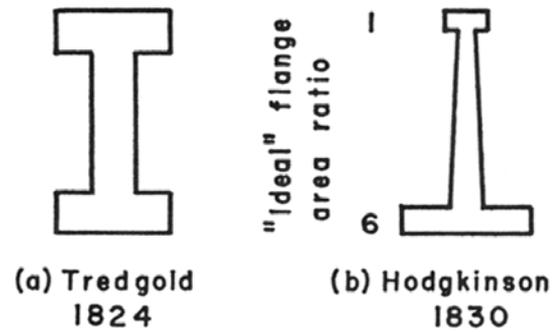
(a) I-section for cast-iron beam, Tredgold, 1824. (b) Hodgkinson's 'Ideal' section for cast-iron beam, 1830. (Jewett)
